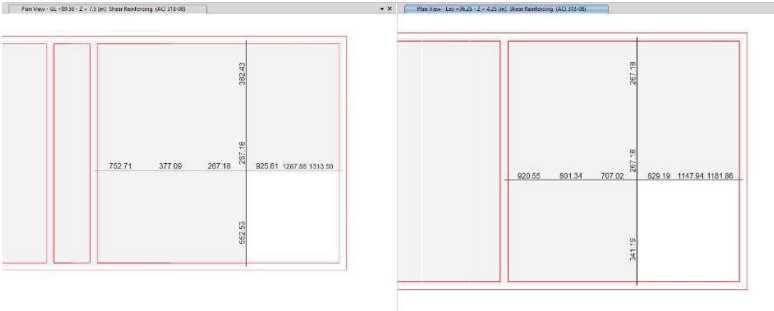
Shear Reinforcing Detail (mm²/m)
